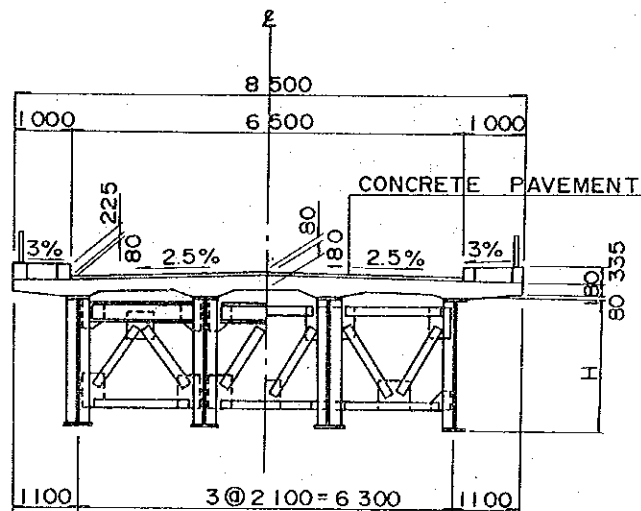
Typical Cross Section of Steel Girder Bridge
